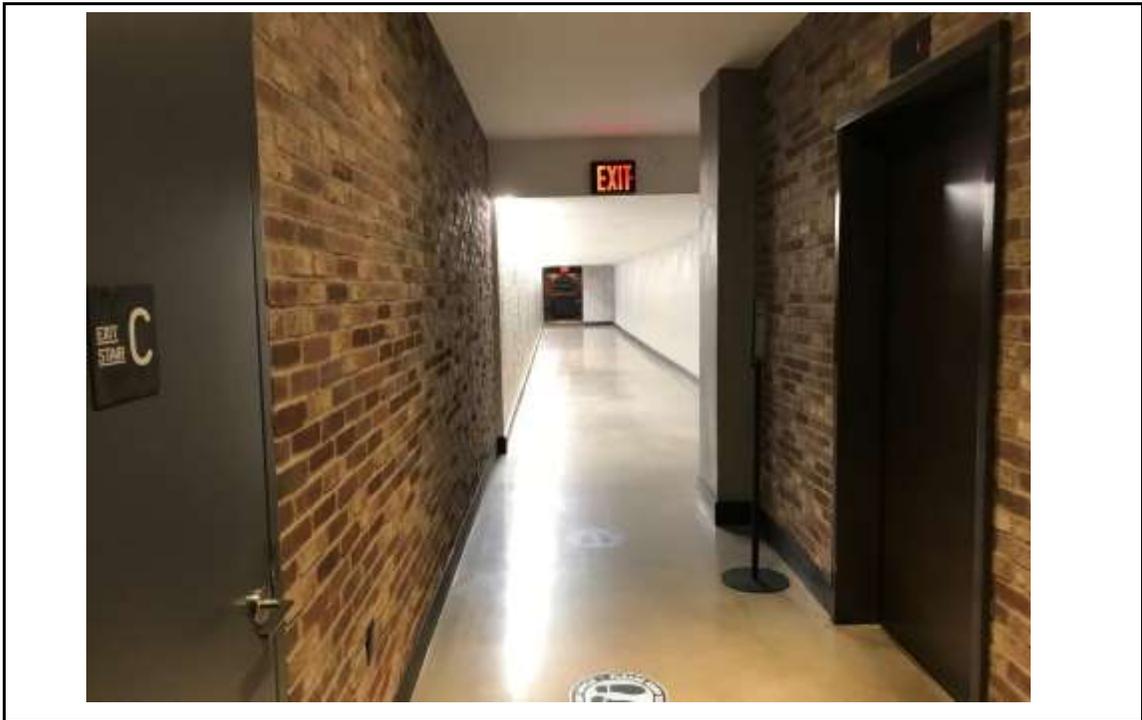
First floor concrete slab covered with flooring, facing west. 20 June 2022.
